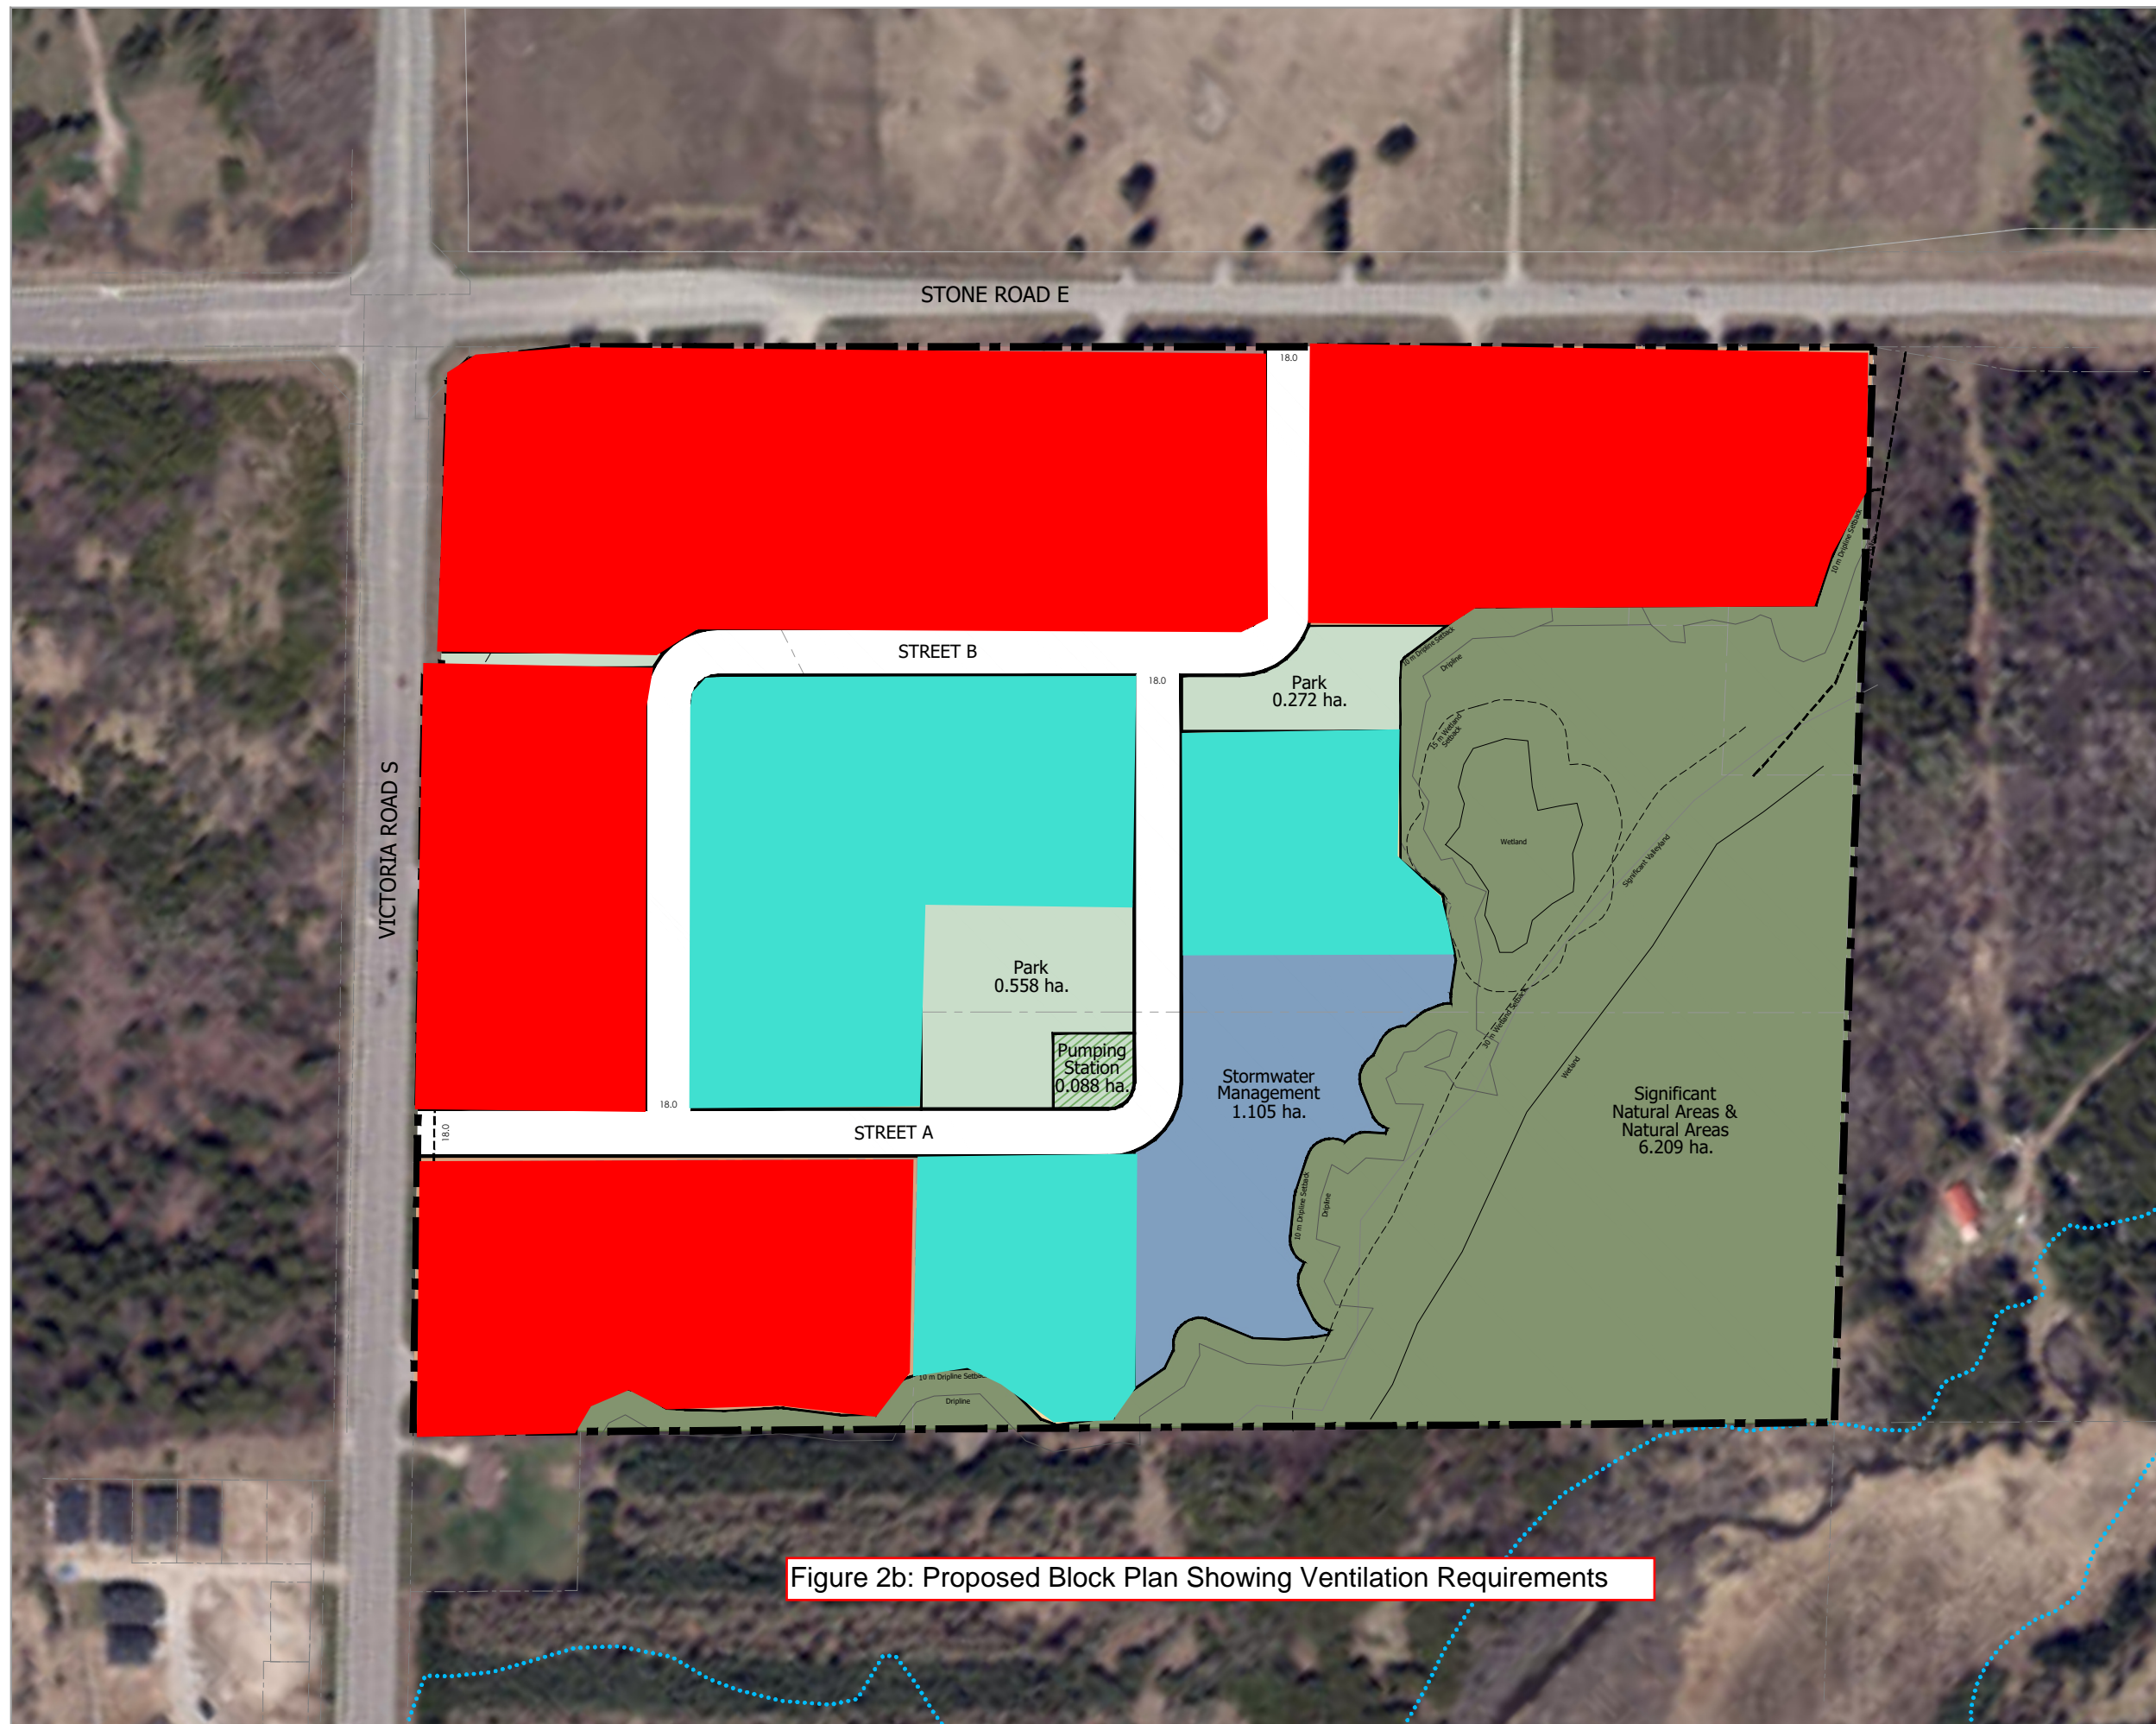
Proposed Block Plan Showing Ventilation Requirements
